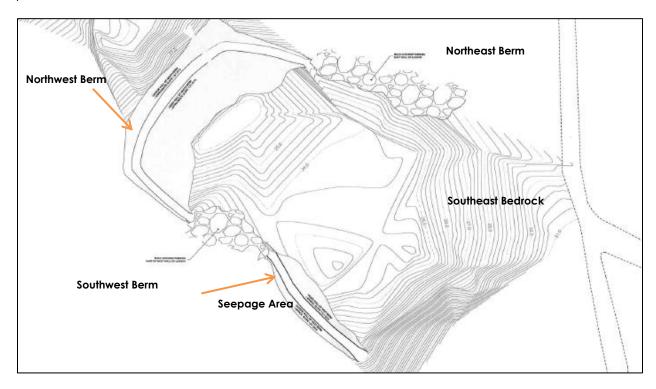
Previous Dam (Extract from Construction Drawing No: 100)
